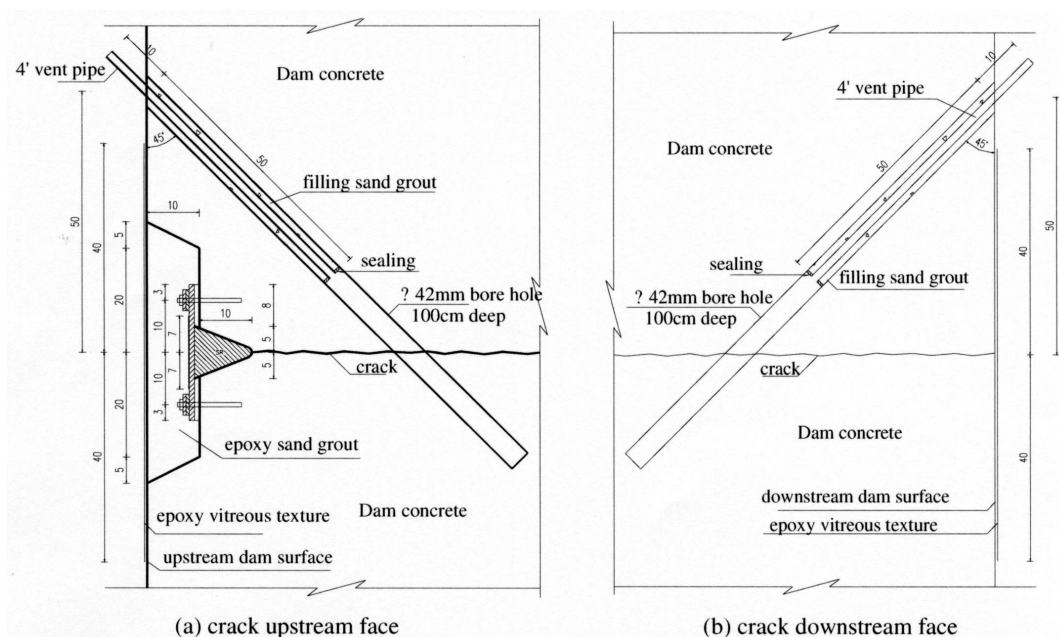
Treatment of the crack upstream and downstream face (unit: cm)
